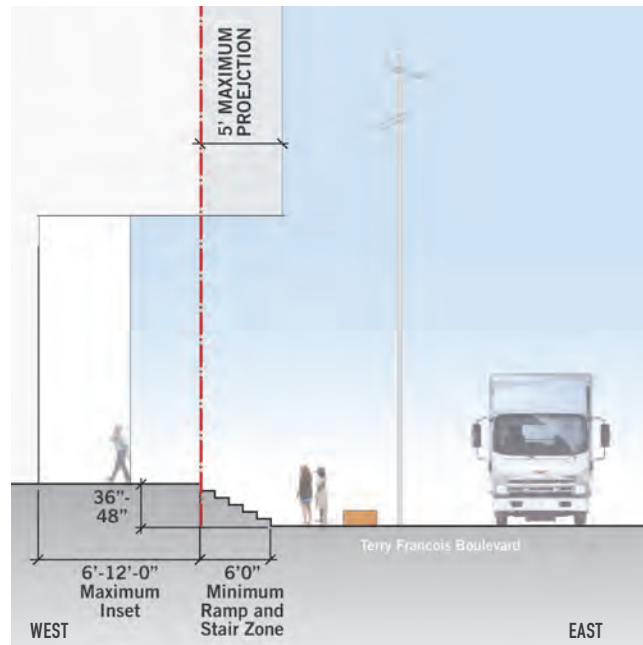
Working Waterfront Zone - Elevated Walkway condition
